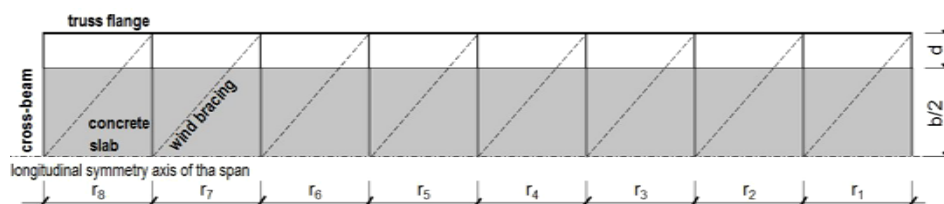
Arrangement of structural members of analysed steel-concrete composite deck
